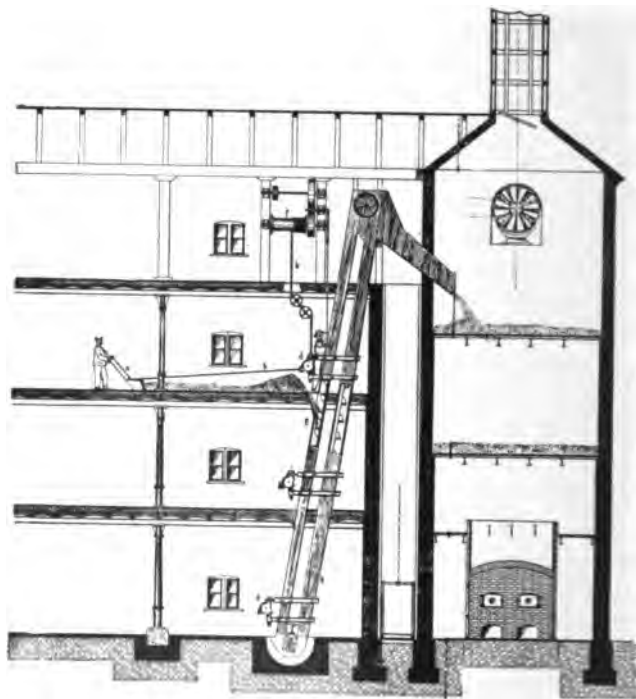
Floor Malting with Power Shovel and Bucket Elevator.
